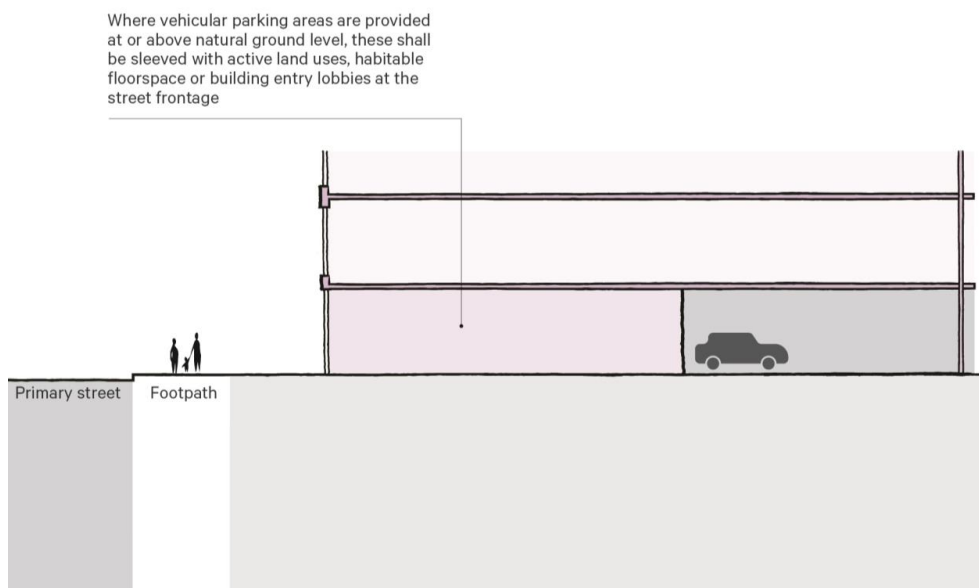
Vehicular parking areas to be sleeved at the street frontage
